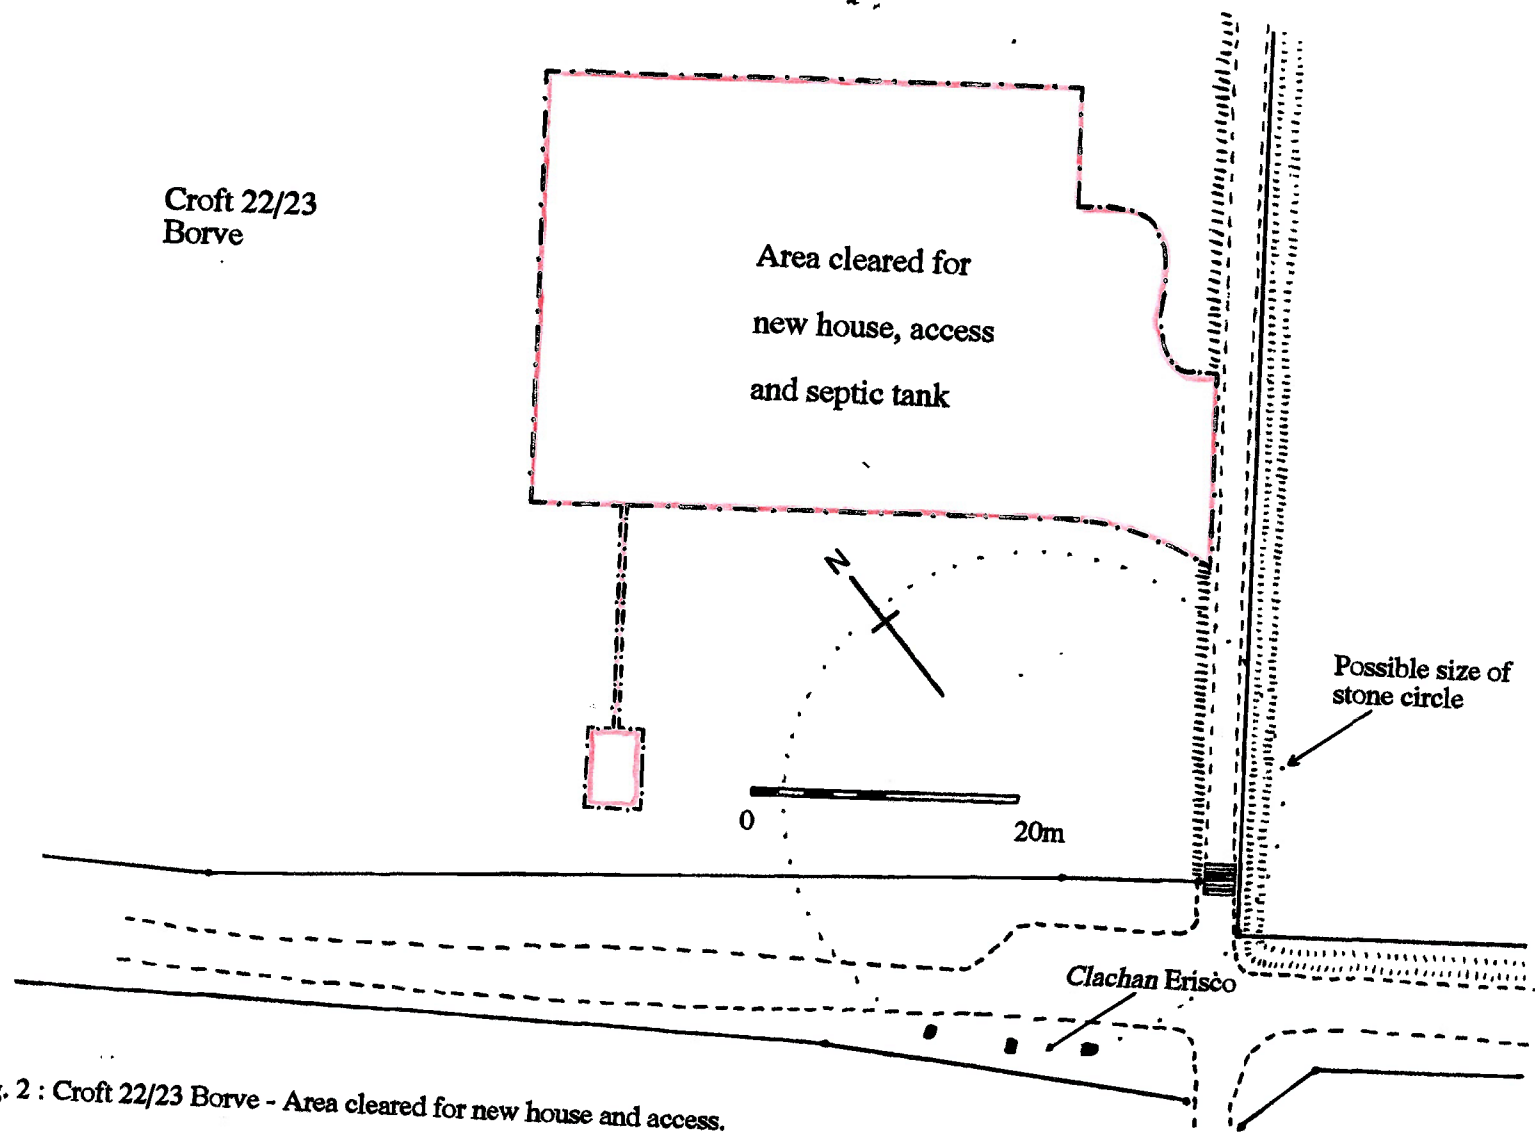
Croft 22/23 Borge - Area cleared for new house and access.
